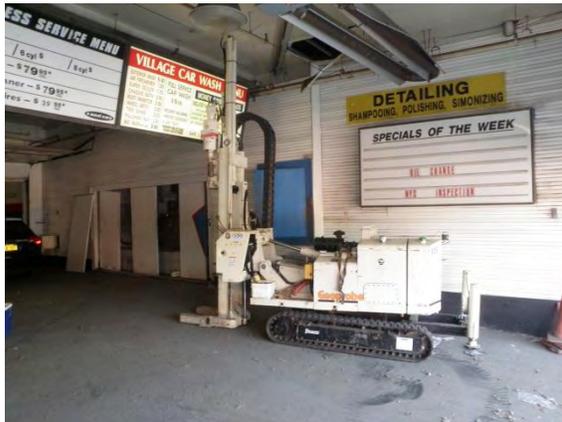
/6b: View of ADT advancing core barrel at boring location SB-1
